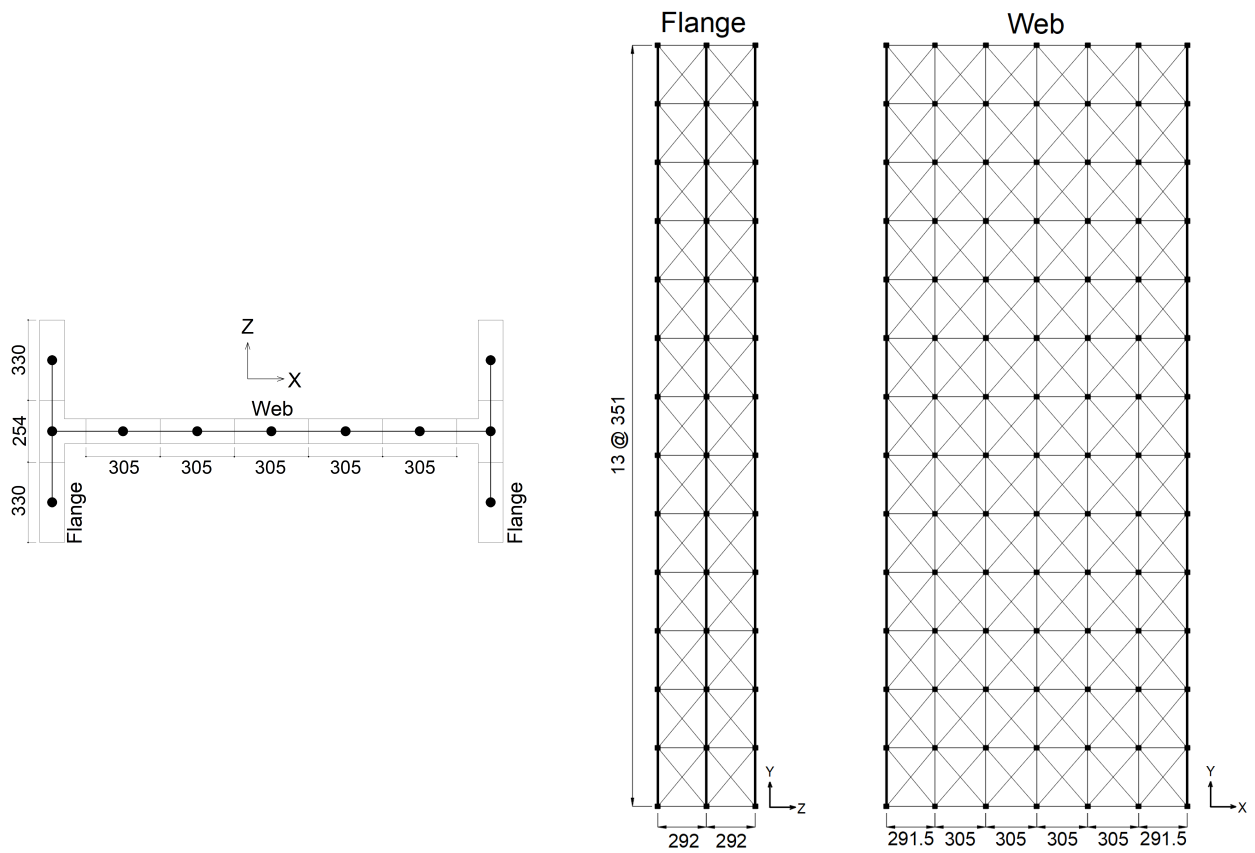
Plan and elevation views of the beam-truss model for F1 [Unit: *mm*].
